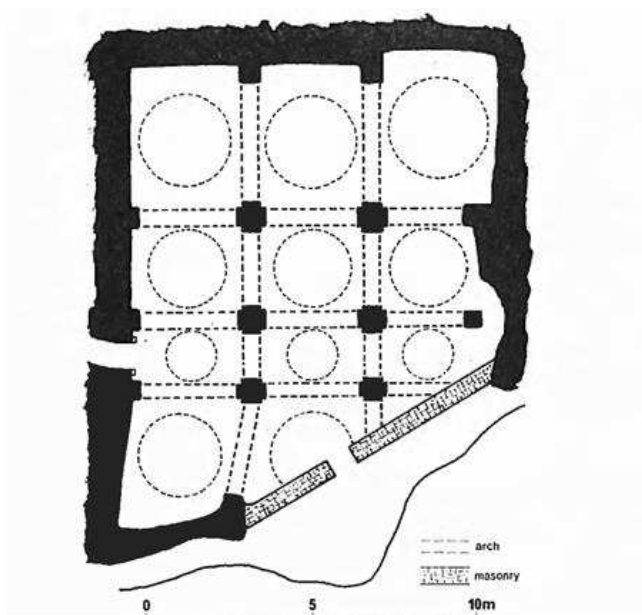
Plan of the Church of Abba Yohanni (Plan from Ruth Plant 1985)
